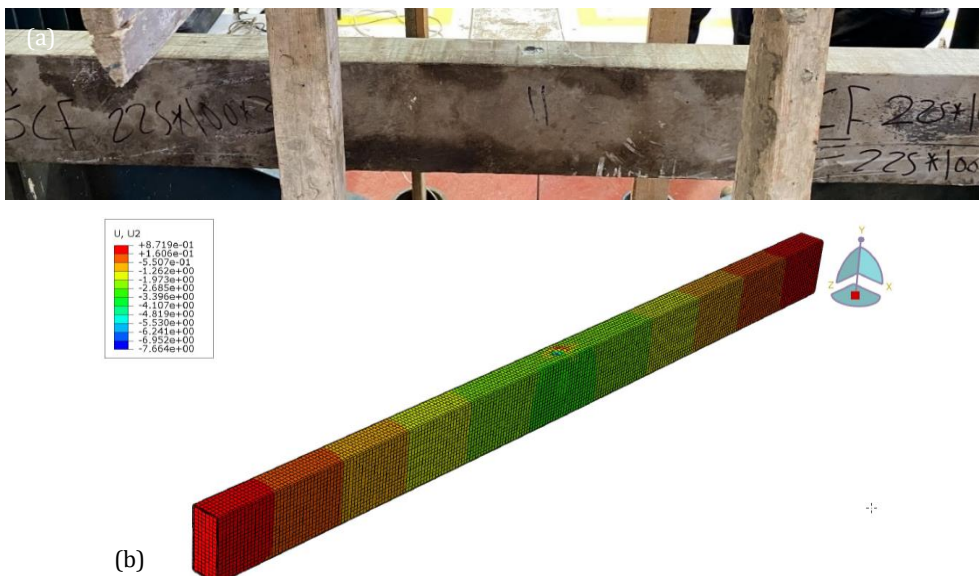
Deformed shape of 100X225X3 filled single-cell column (SCC-F):
